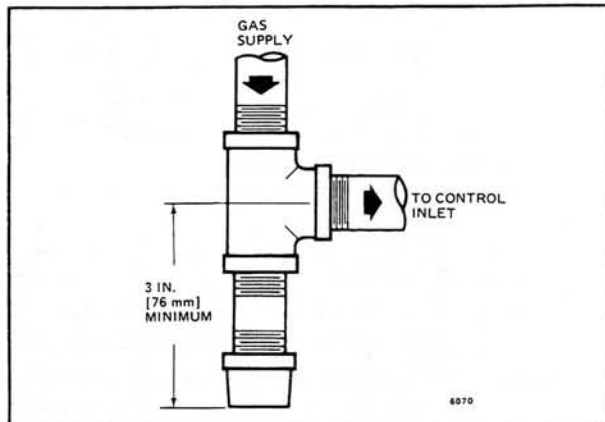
TYPICAL DRIP LEG (SEDIMENT TRAP) INSTALLATION.
